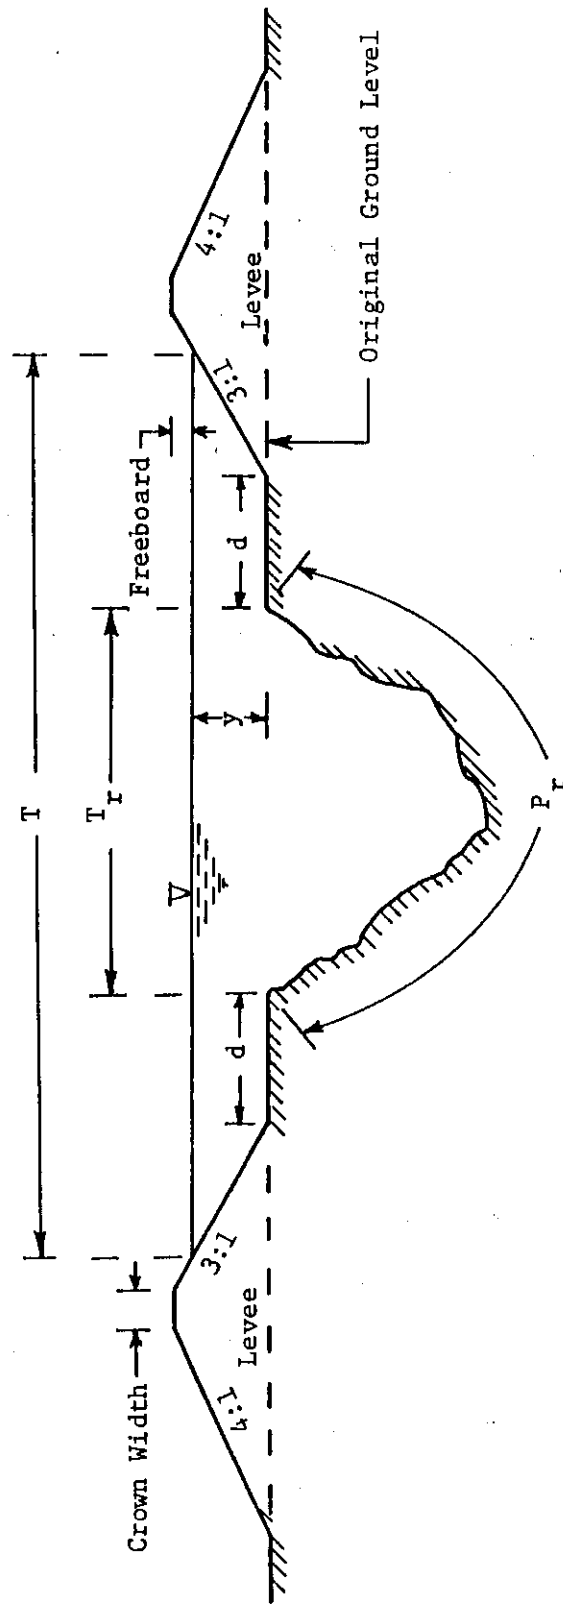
DEFINITION SKETCH OF LEVEE DESIGN
